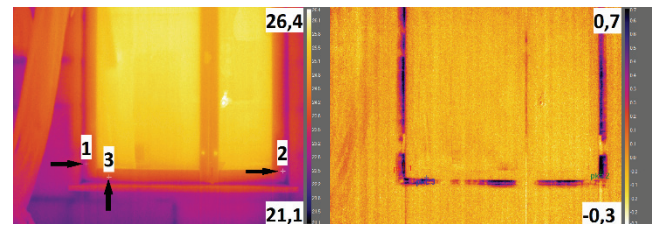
A window reference and differential thermogram, from a room on the ground floor of Building No. 1 [6]
